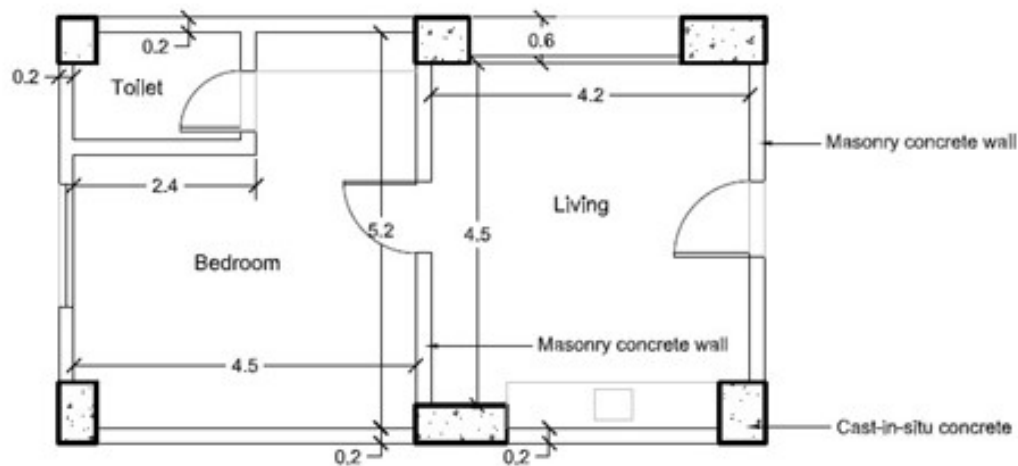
Prototype dwelling with a single concrete wall as a building envelope (drawing is not at scale)
